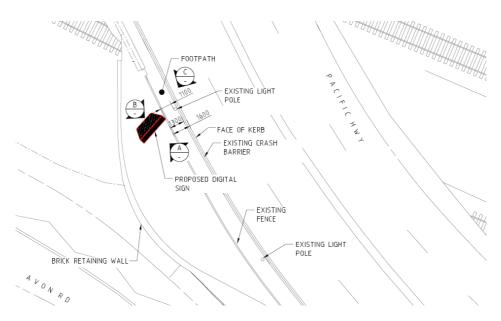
| Site plan of the proposed signage (Source: Applicant's documentation)
